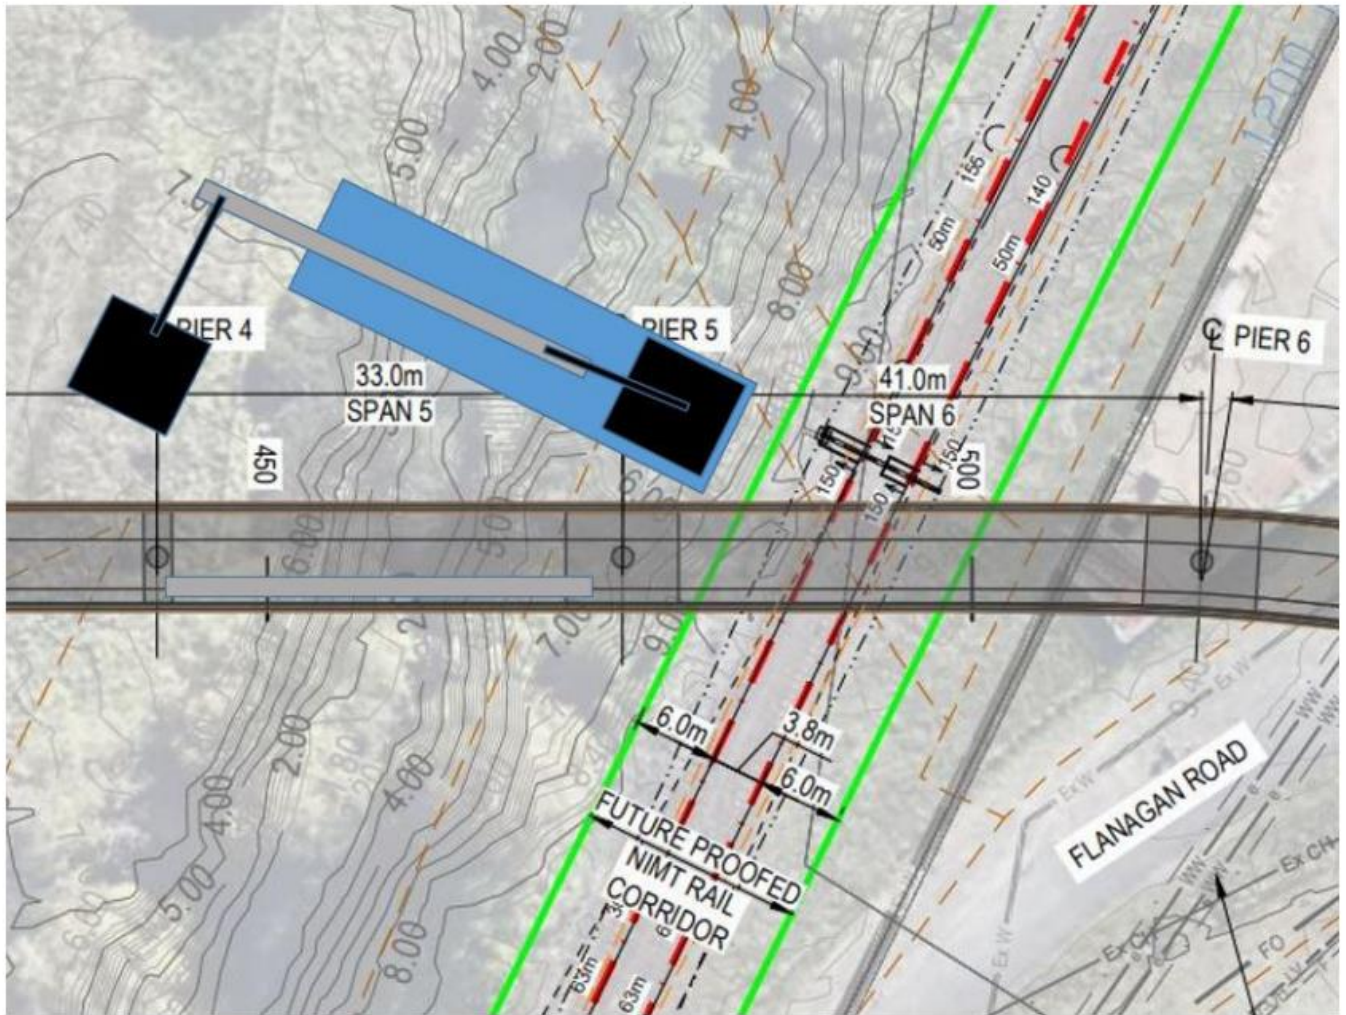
The tandem lift for beams between Pier 4 and Pier 5
